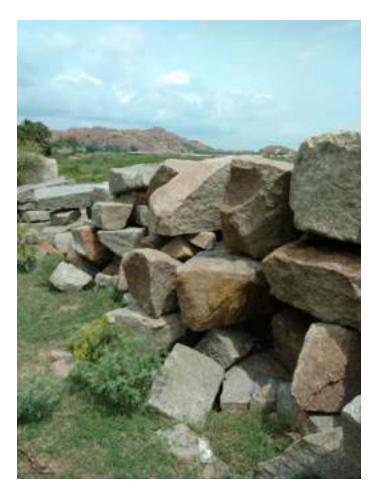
The inner facade of the fort wall requires complete reconstruction with ancient stones.
